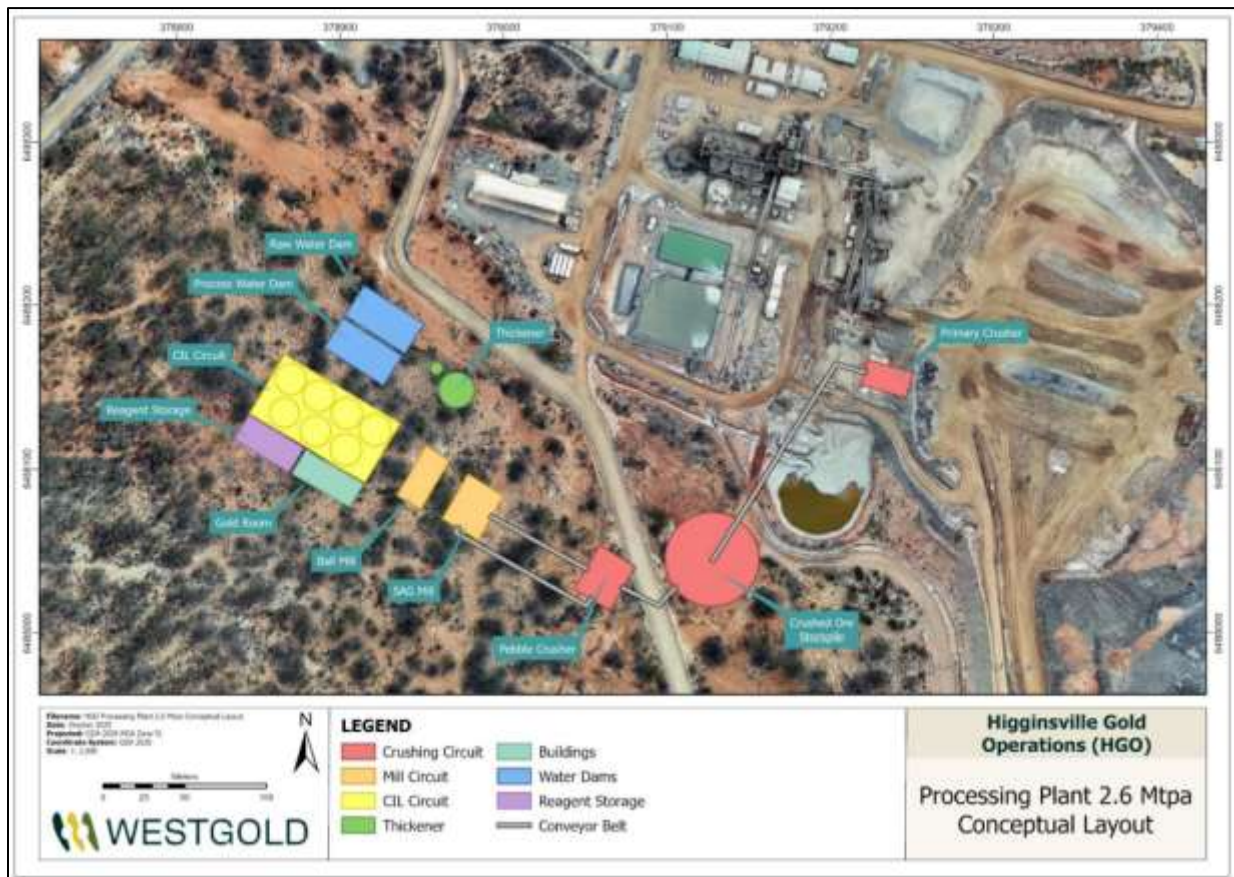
Proposed Higginsville 2.6 Mtpa Processing Plant Layout
